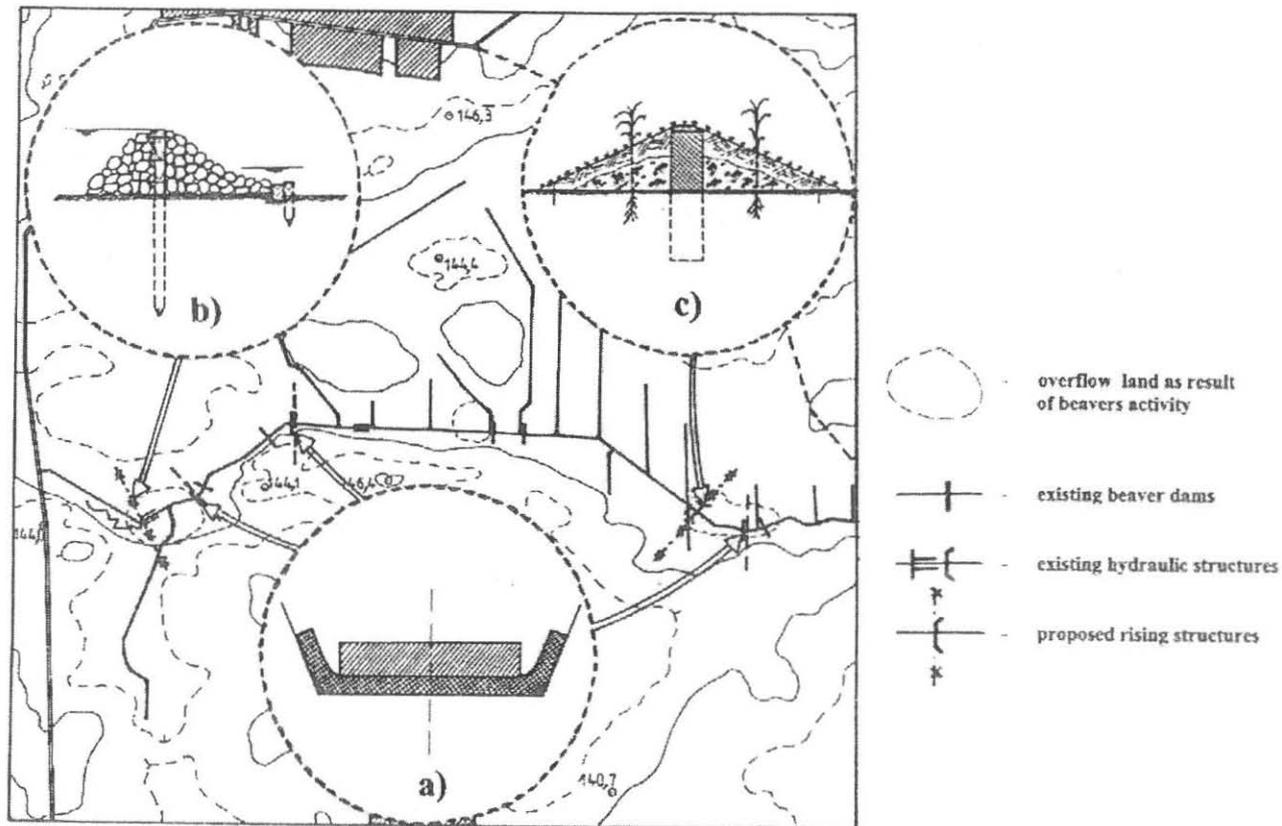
Hydrographic net and localisation of hydraulic structures at the section of the Małynka river valley predicted for restoration: a) gabion step, b) dam constructed from wood and stone covering, c) "camouflage of concrete gate
